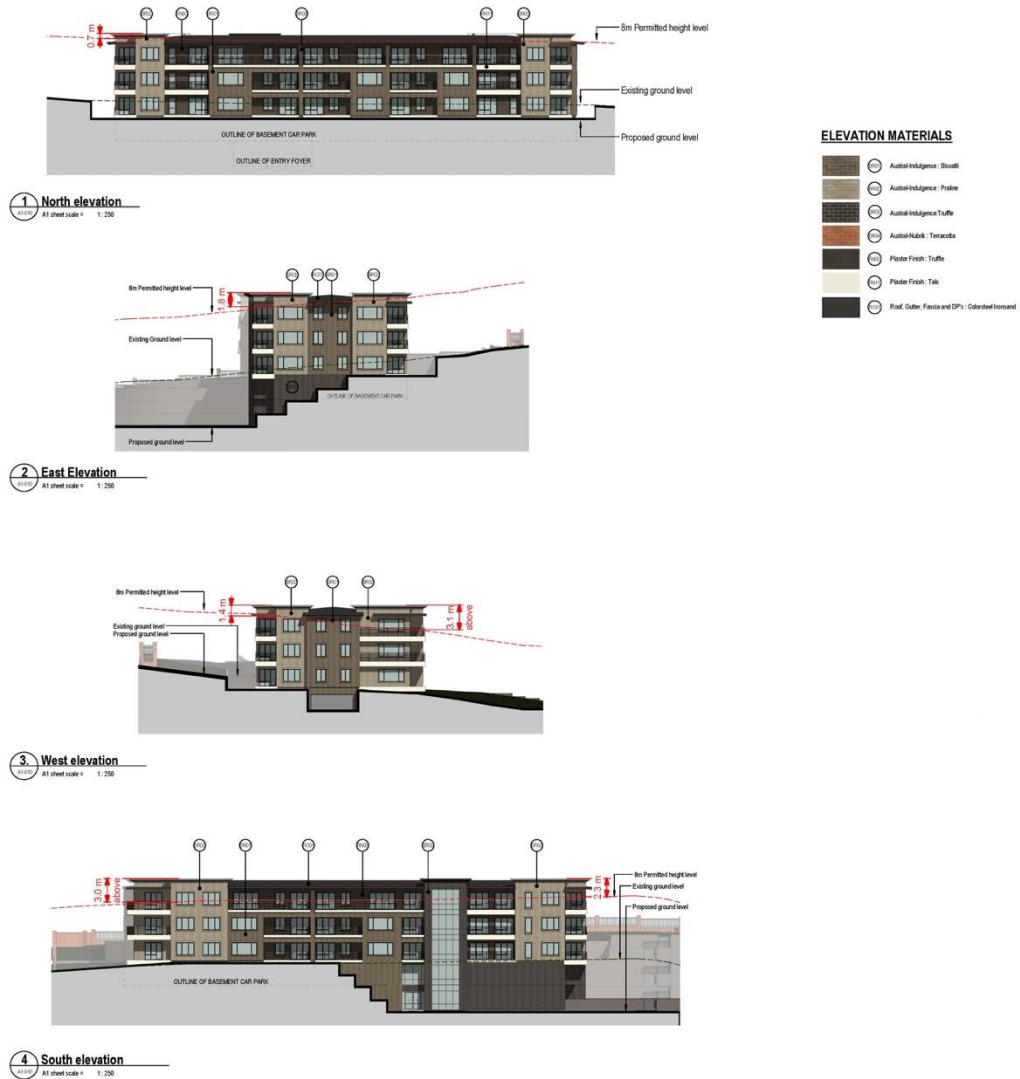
From top to bottom: The north, east, west and south elevations of Building B04 (Ryman Drawing A2-040 RC23).
